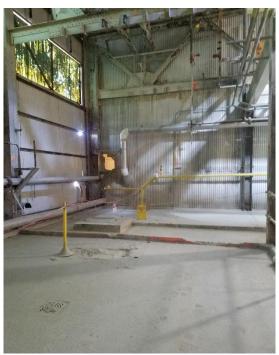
3<sup>rd</sup> and 4<sup>th</sup> Floor Walls in the northwest corner of the Southwest Quadrant with rope and signage to restrict access, looking north
